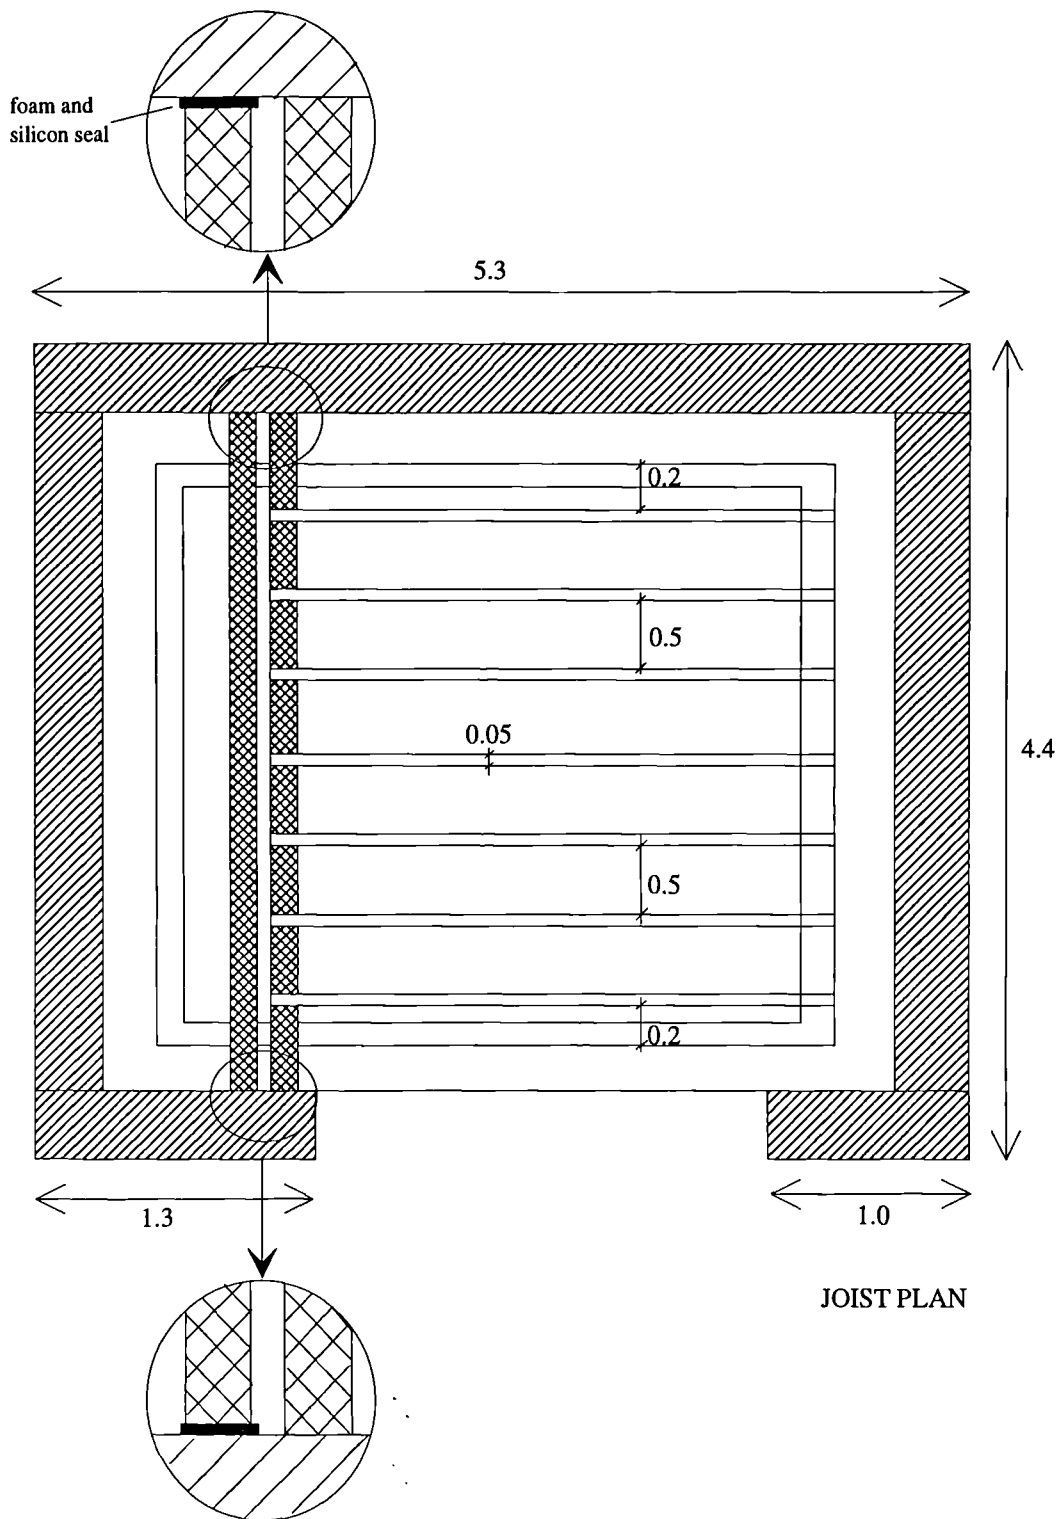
Plan of common opening in vertical transmission suite showing cavity wall and built-in joists.
